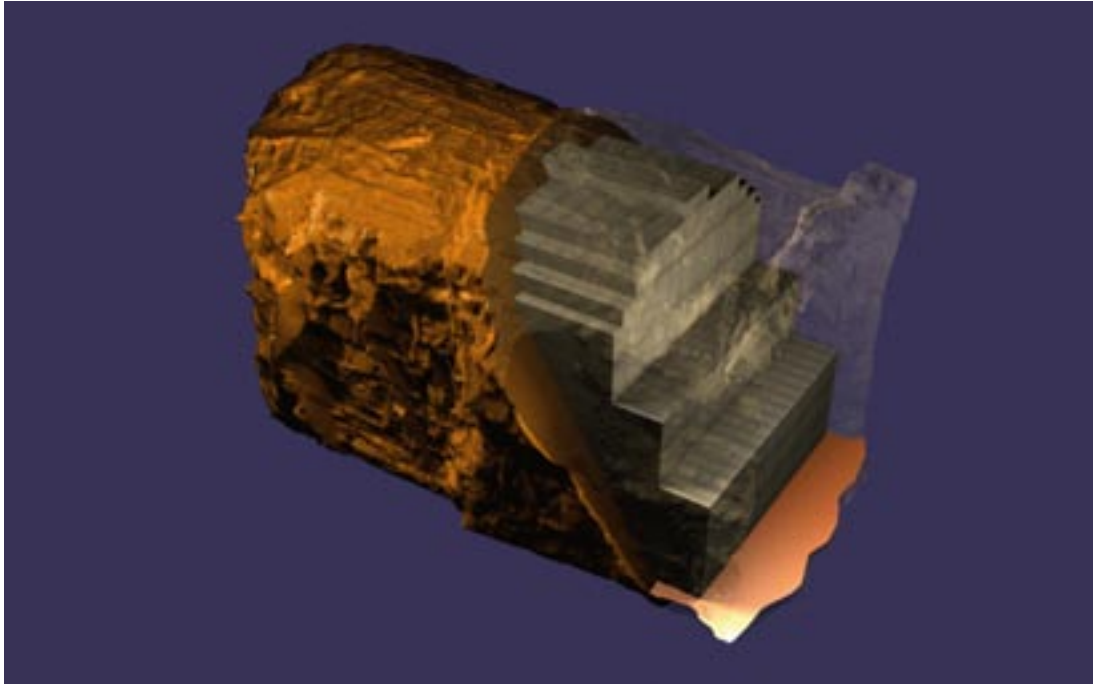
Picture showing a section of the modelled tunnel with the block masonry installed. On the left side a big rock block has fallen leaving a steep planar fracture exposed.
